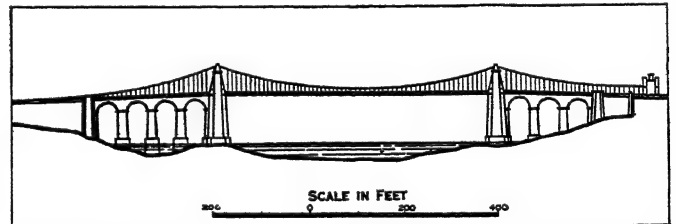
MENAI WROUGHT IRON SUSPENSION BRIDGE, WALES, 1826
